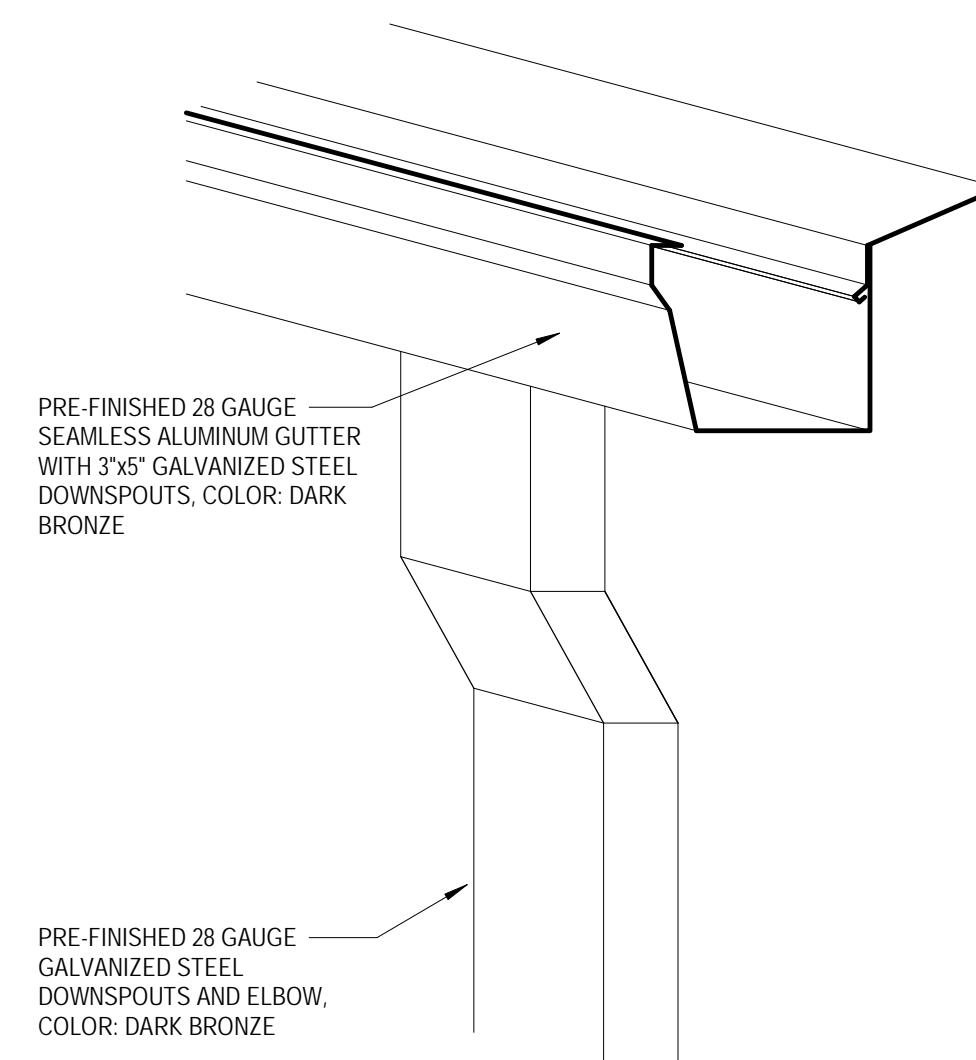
DETAIL AT TYPICAL GUTTER AND DRIP EDGE DETAIL
